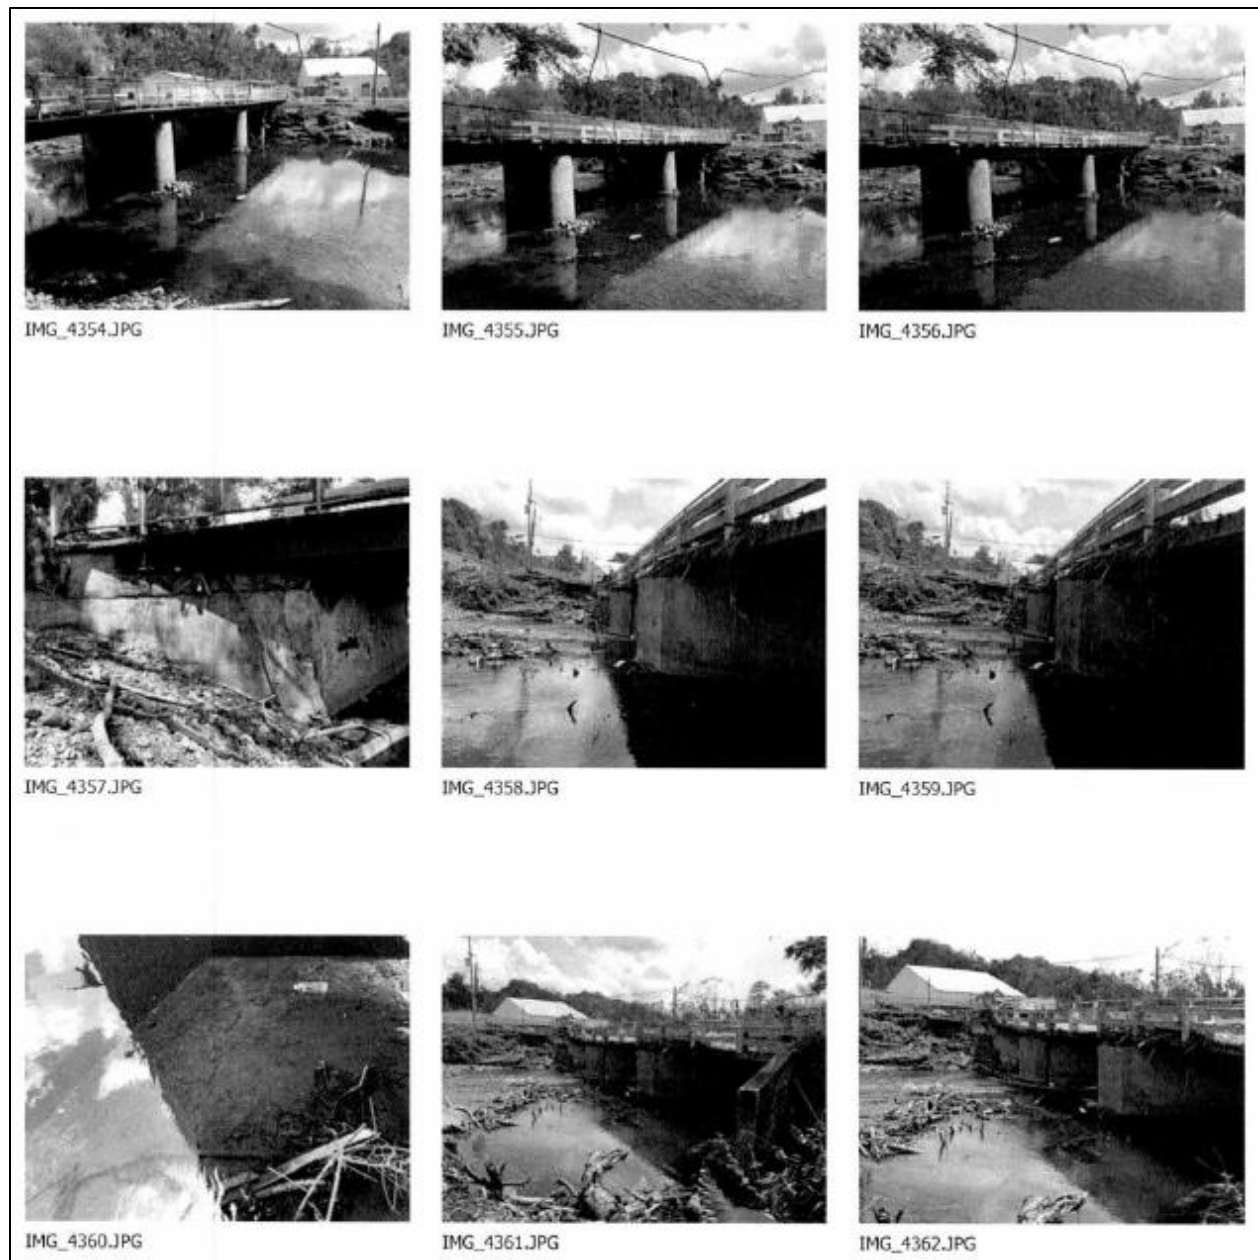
Bridge 1714 photos from September 22, 2017 inspection (source: PRHTA)
